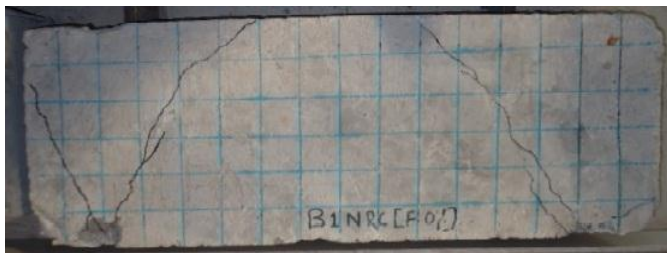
Crack Pattern of beam D30 NRC [F0%]
